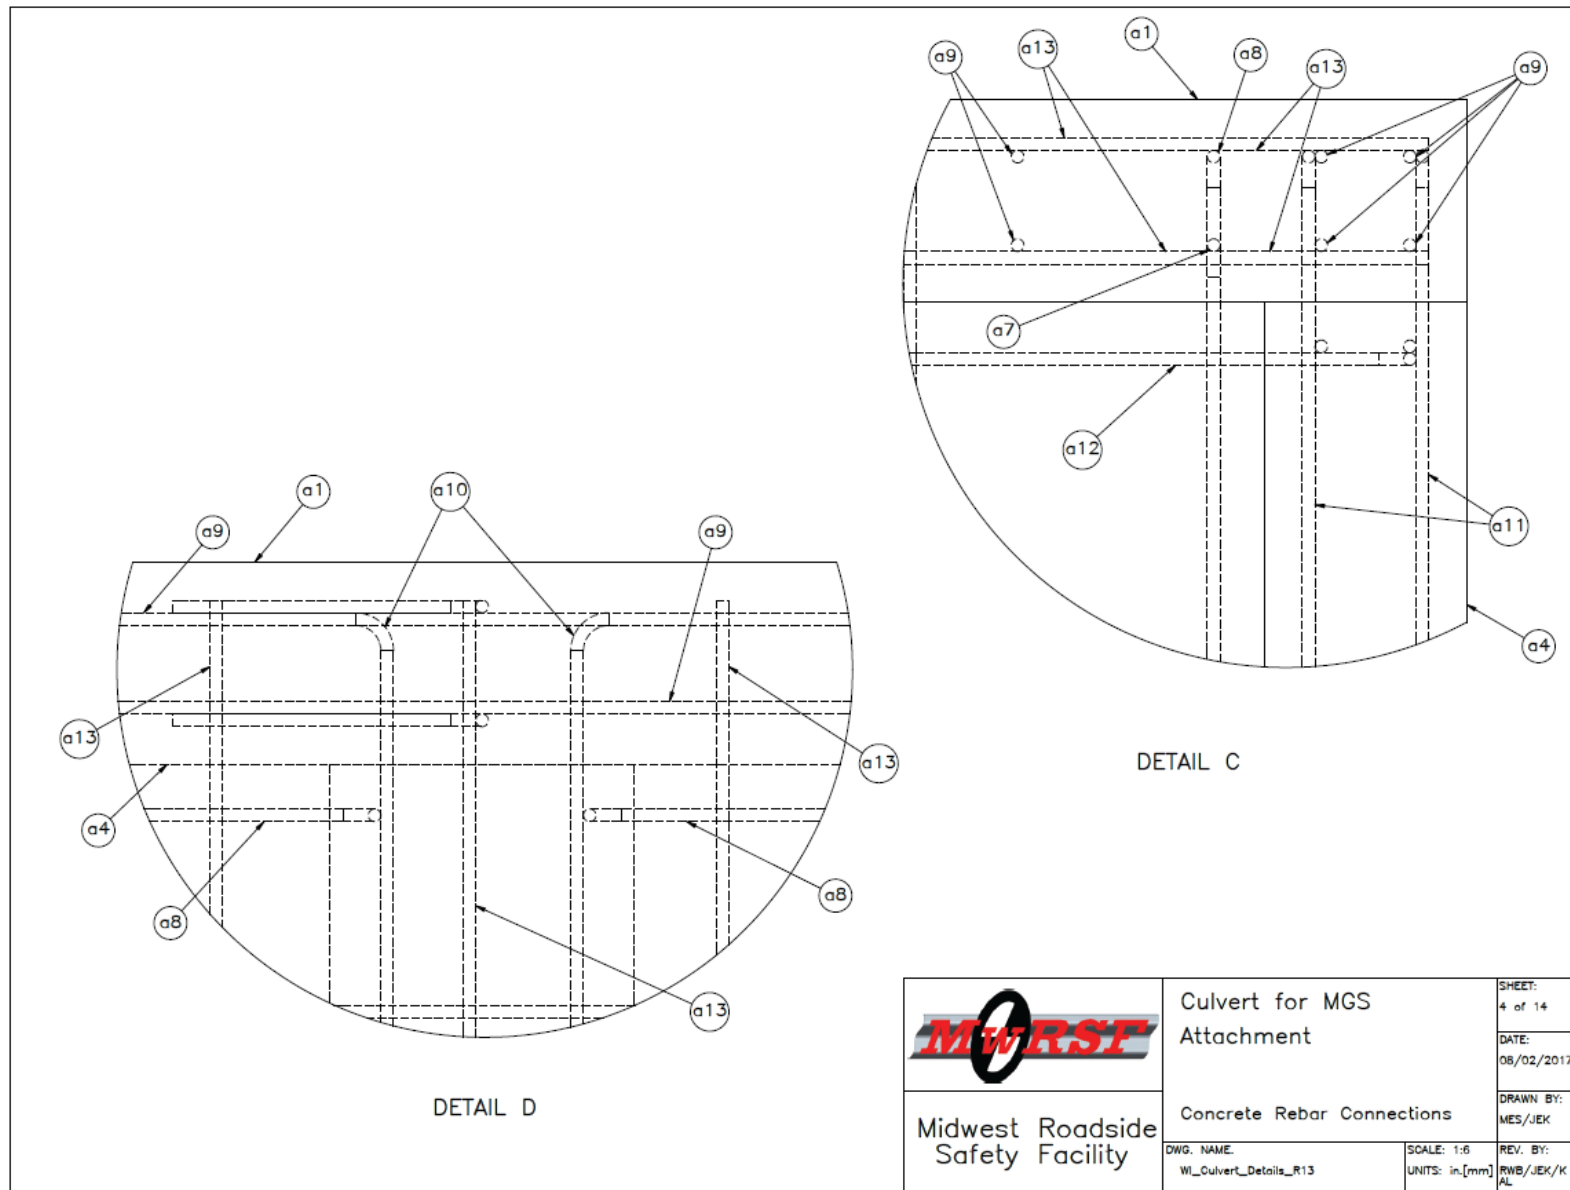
Concrete Rebar Connections (Cont.), Test Nos. CMGS-1 and CMGS-2
